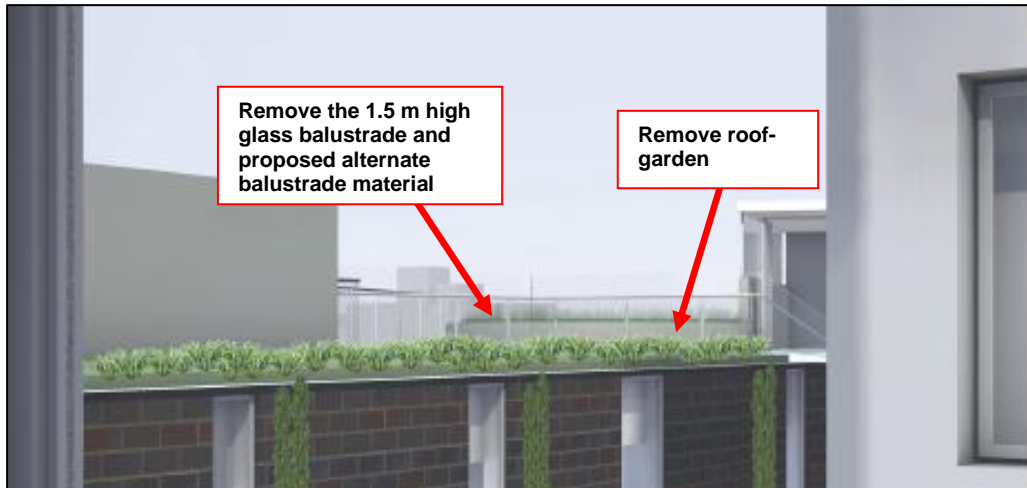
Details of privacy measures (elevation) (Source: Applicant's RtS)
